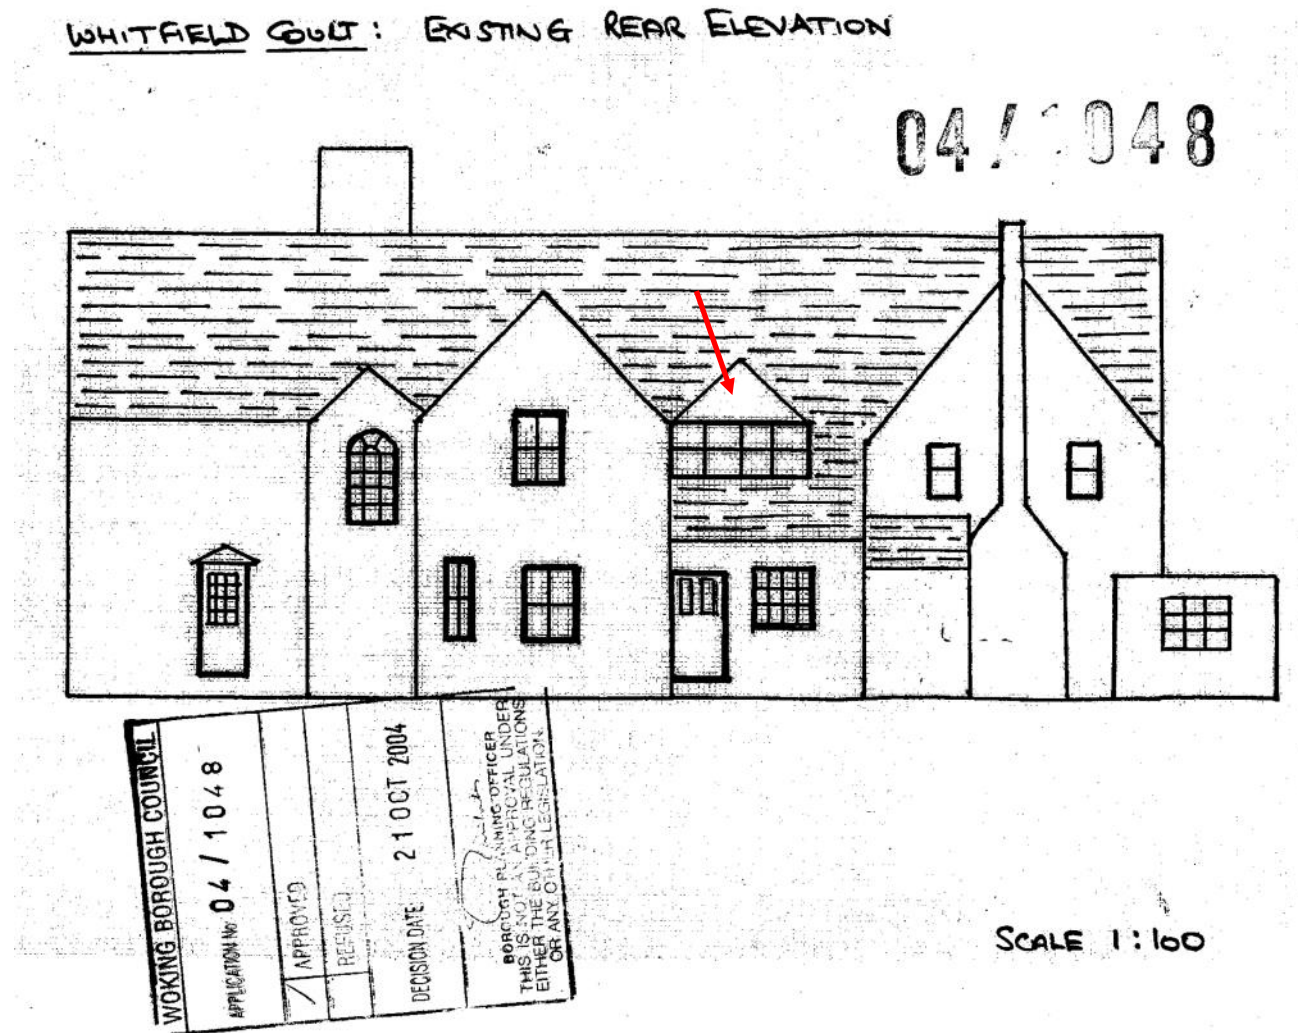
Existing Rear Elevation in 2004 as part of Application Reference: PLAN-2004-1048. Note the dormer window to the outshut extension (marked in red).
